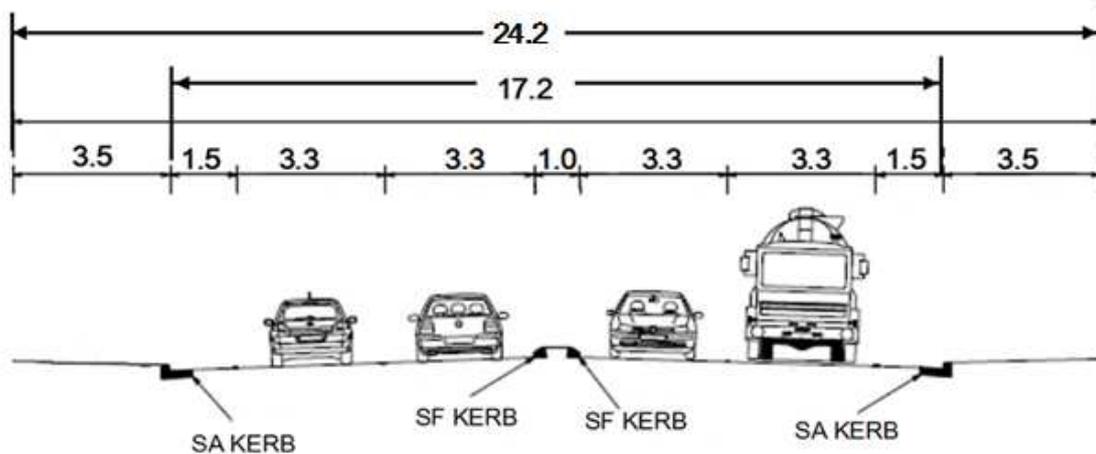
TYPICAL SECTION - MINIMUM SECTION WIDTHS
